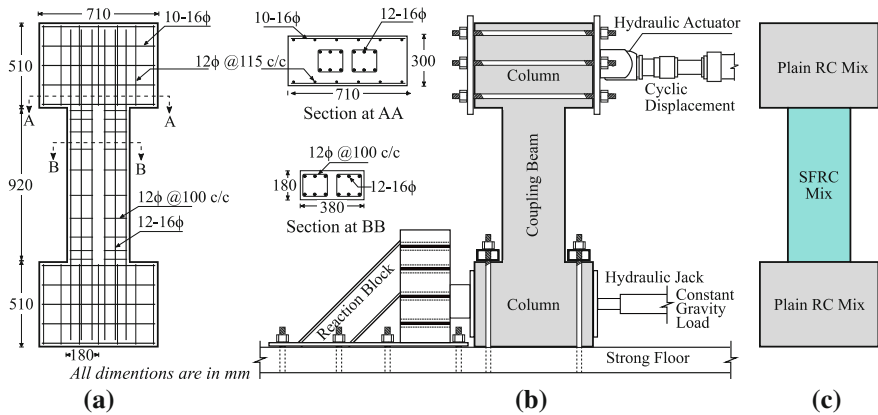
a The reinforcement detailing of coupling beams, b details of test setup and c location of SFRC
